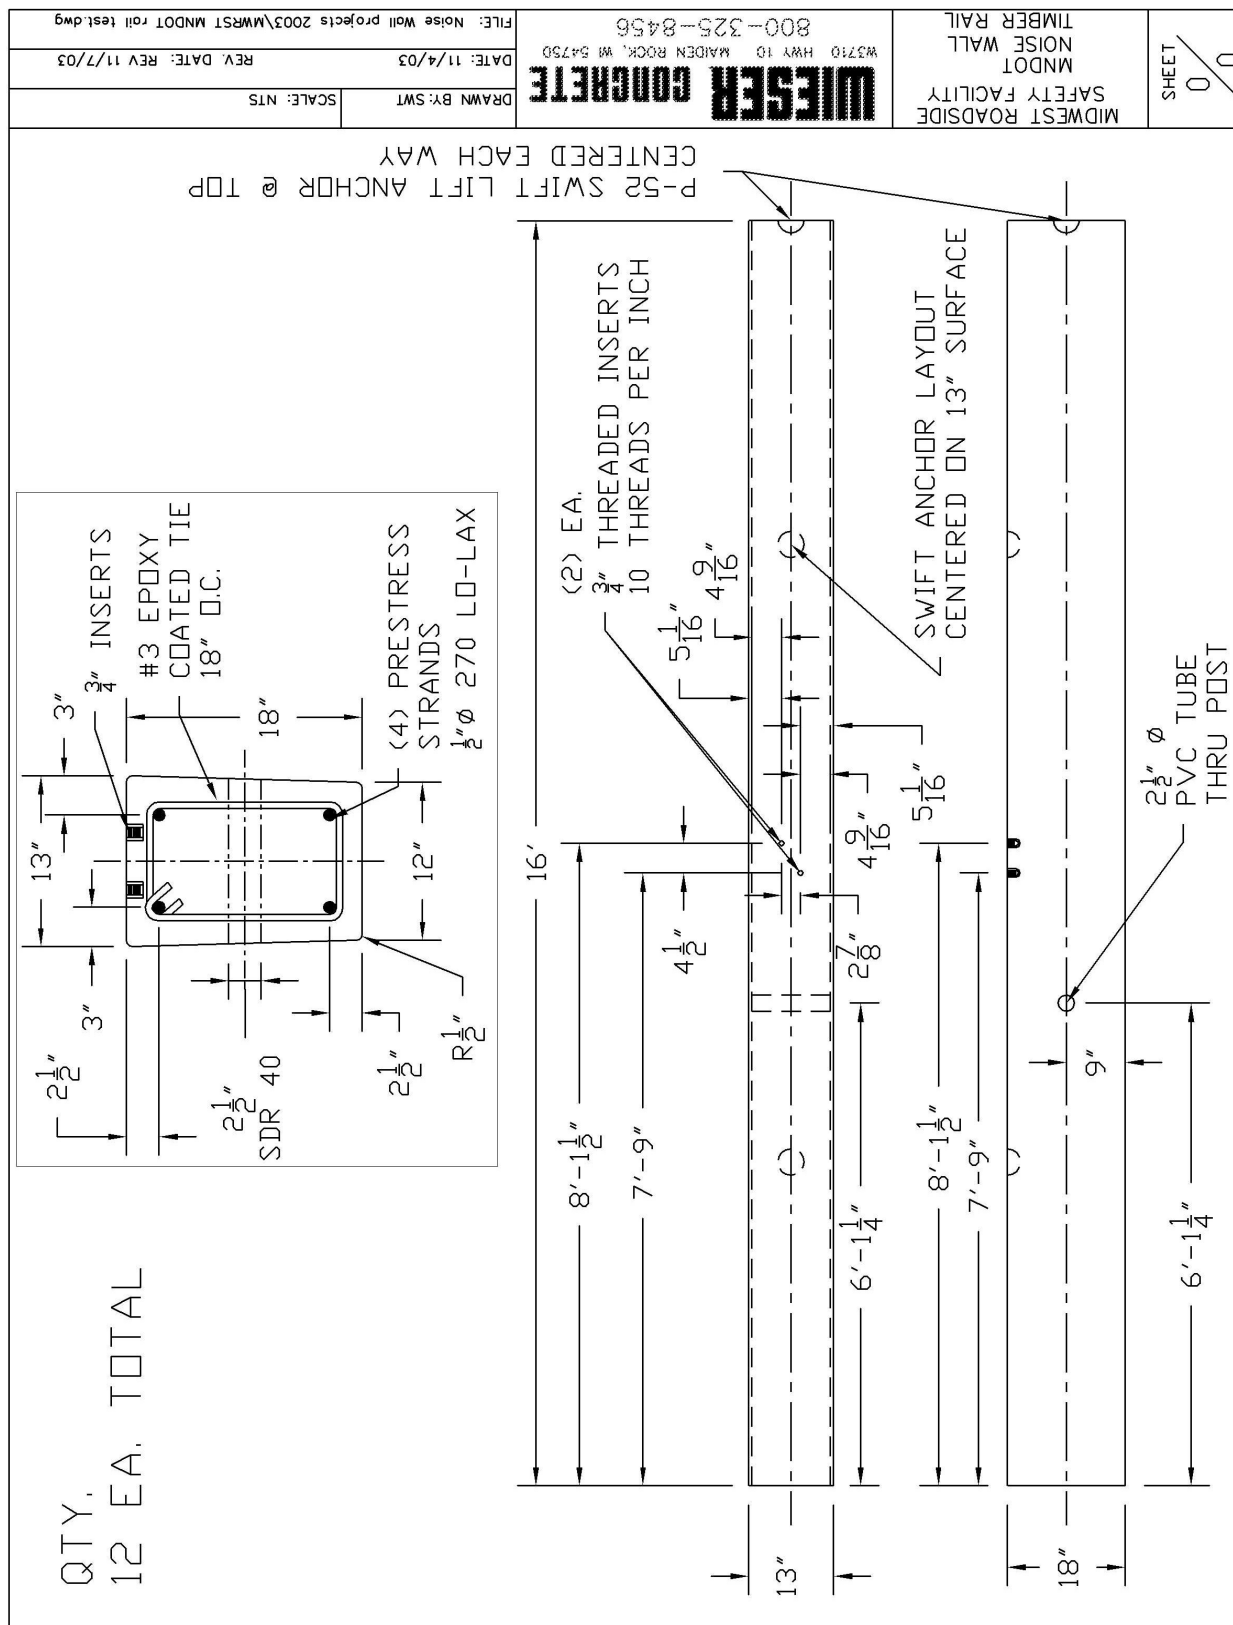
Wieser Concrete's Concrete Post Details (English)
